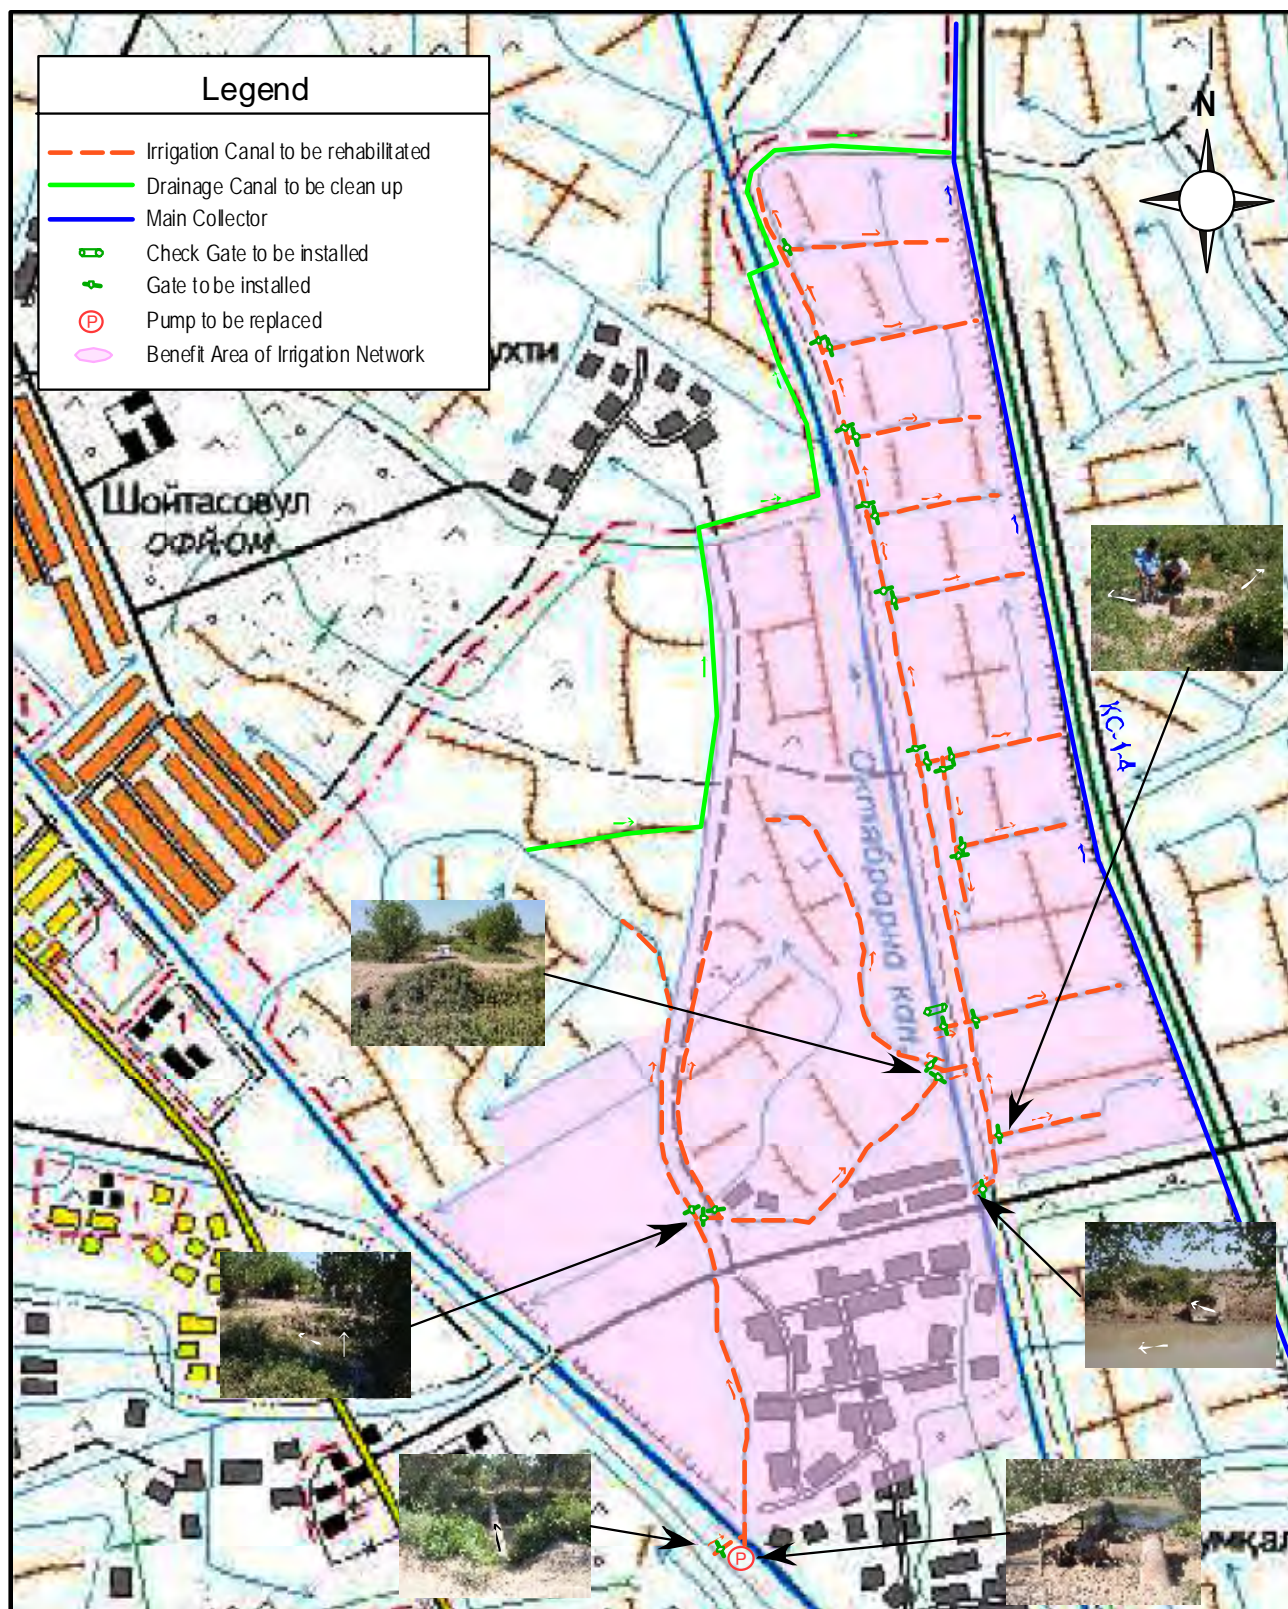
Improvement Plan for Irrigation and Drainage Network on Maksim Canal System in Kattagar Arna WUA
